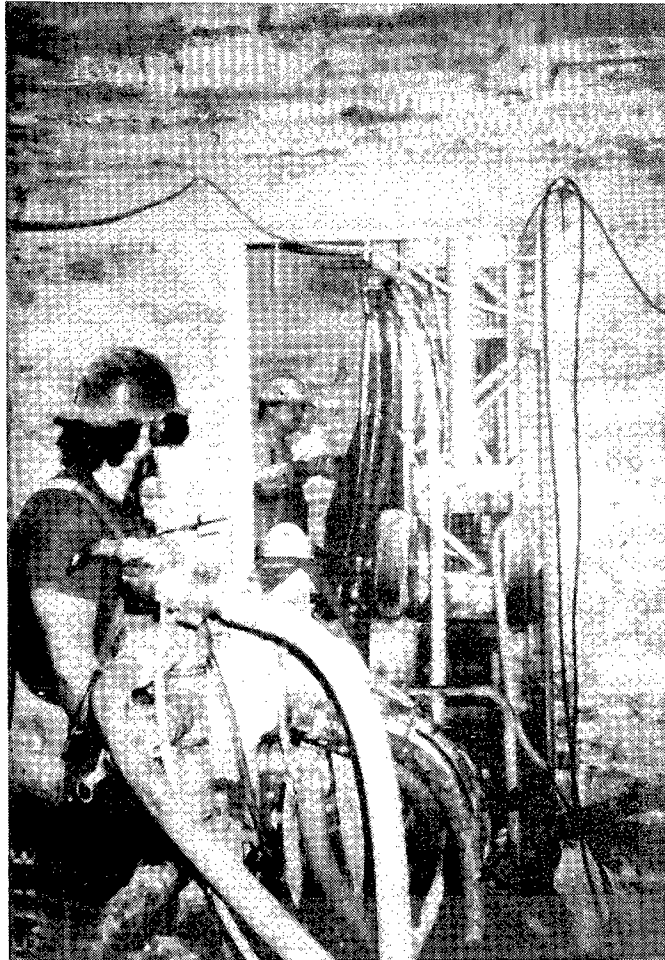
Installation of micropiles in a fully operational transit repair facility, Coney Island, New York.
